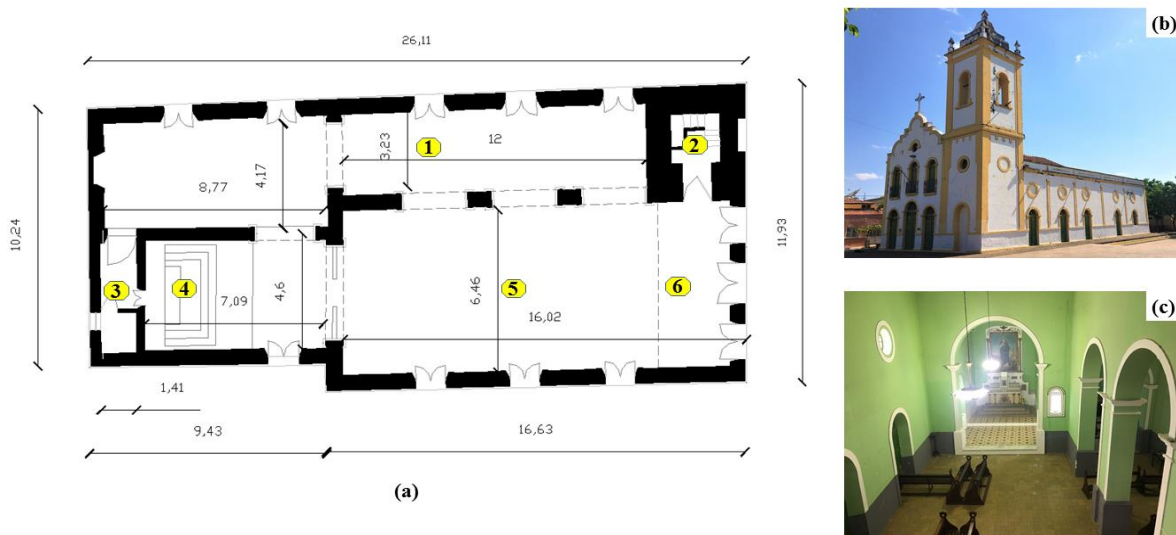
View of the Nossa Senhora das Dores Church: (a) Floor plan where (1) indicates the aisle, (2) lateral tower, (3) sacristy, (4) main altar, (5) central nave and (6) coro-alto; (b) main facade and (c) superior view of the main nave.
